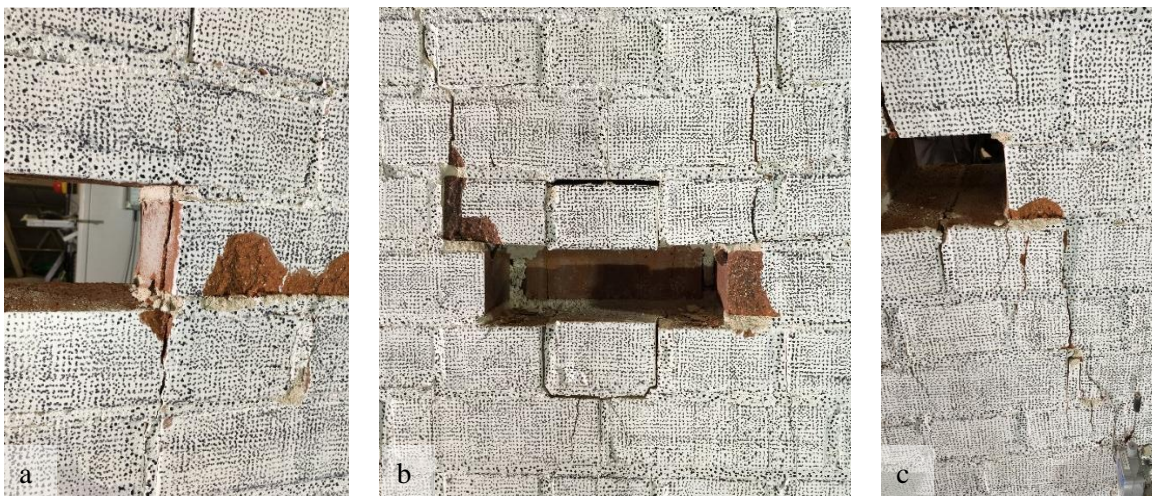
Crack formation in the tests on walls with a missing brick (a: sw-hole-2, b: cb-str-1, c: cb-head-1)
